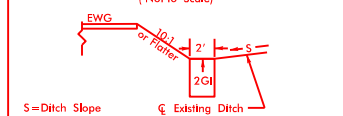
DETAIL APROPOSED INLET CHANNEL STABILIZATION
